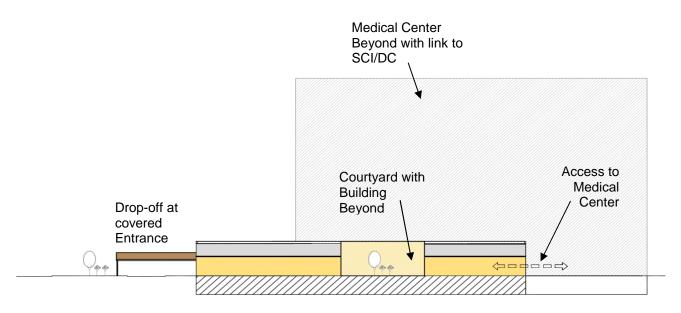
Generic Site Section: Single-level SCI/D Center with Link to Medical Center NTS
